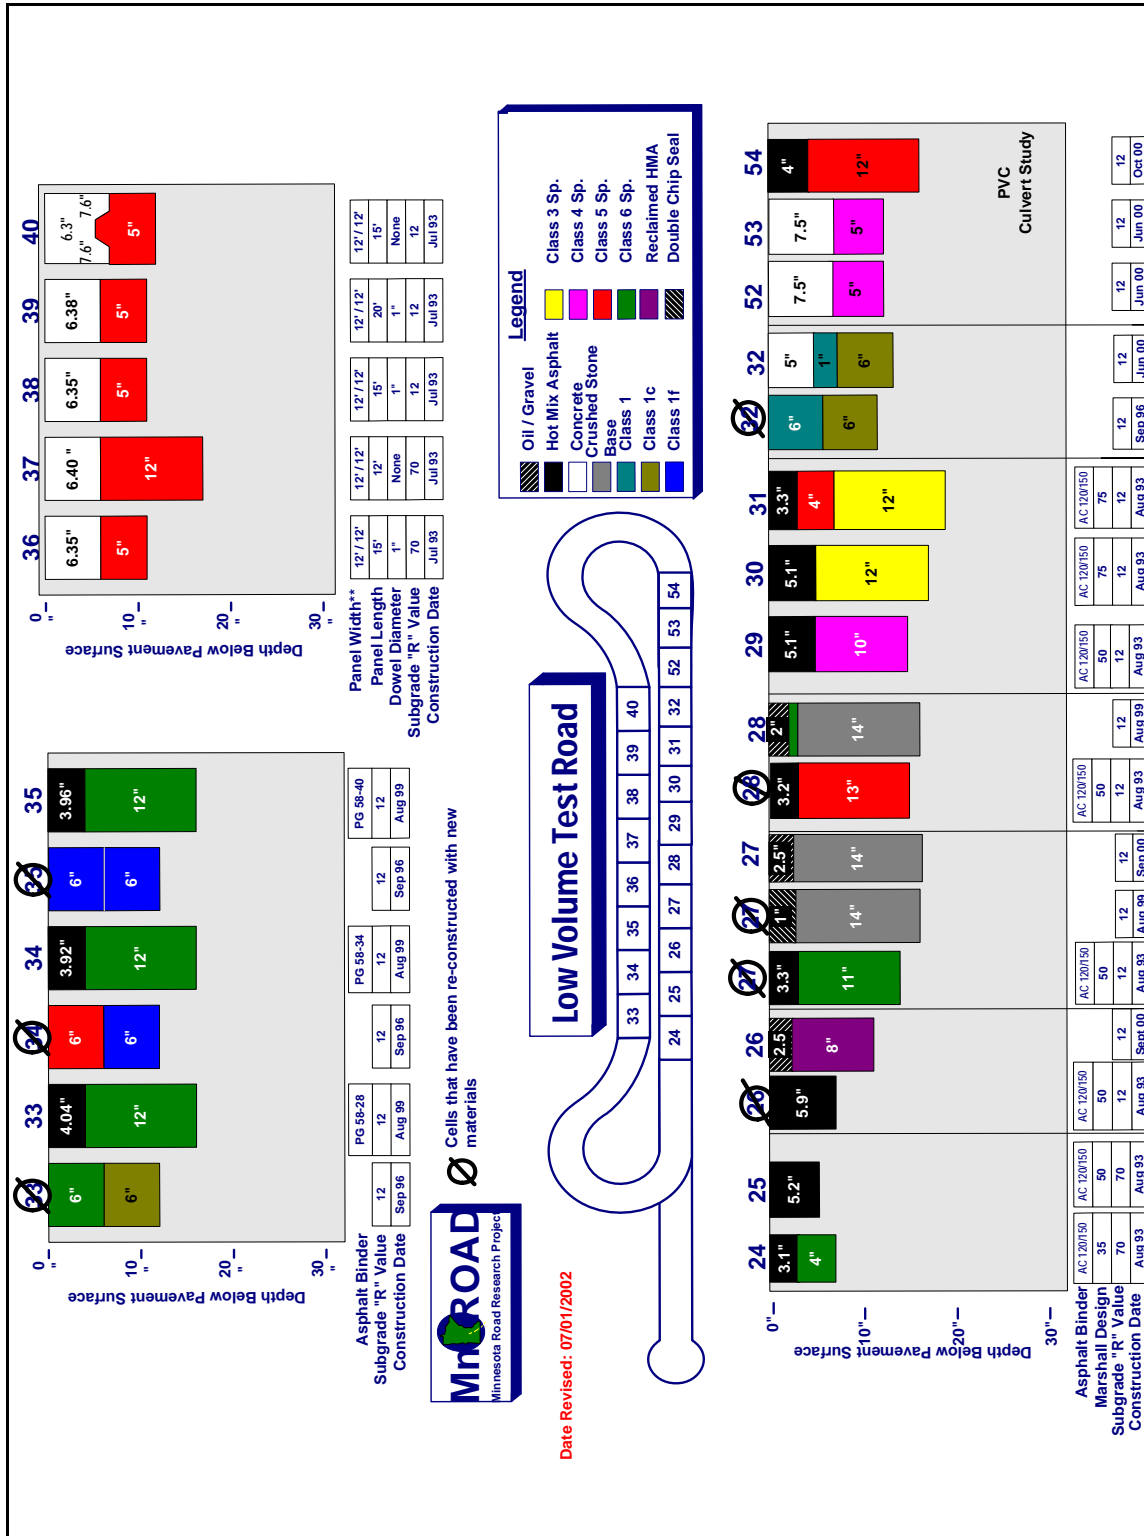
MnROAD TEST CELL LAYOUT (Low Volume Road)
